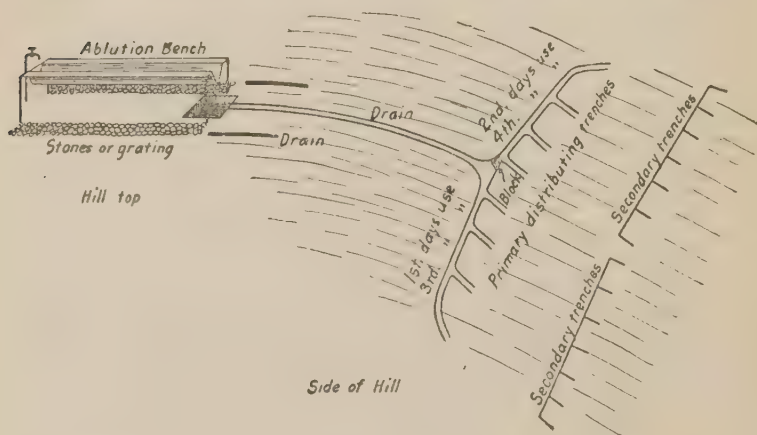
ABLUTION-PLACE AND DRAINAGE IN CAMP.
